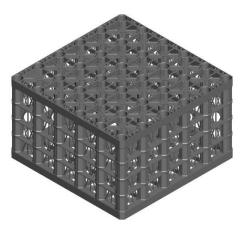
Insert and click the 4 side frame panels into the large bottom plate align the top Large Plate in position and lock with rubber hammer in place. Starting from one end to other.
